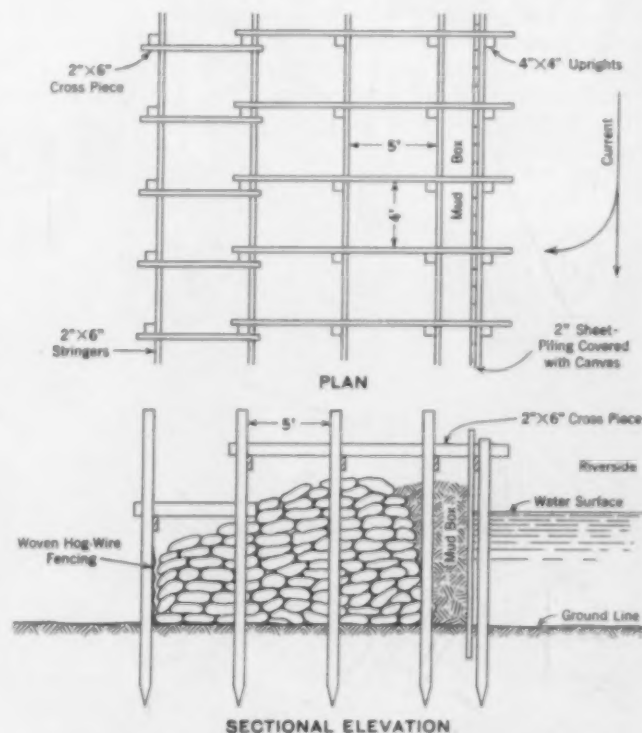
IDEAL METHOD OF CONSTRUCTING A SAND-BAG DAM
